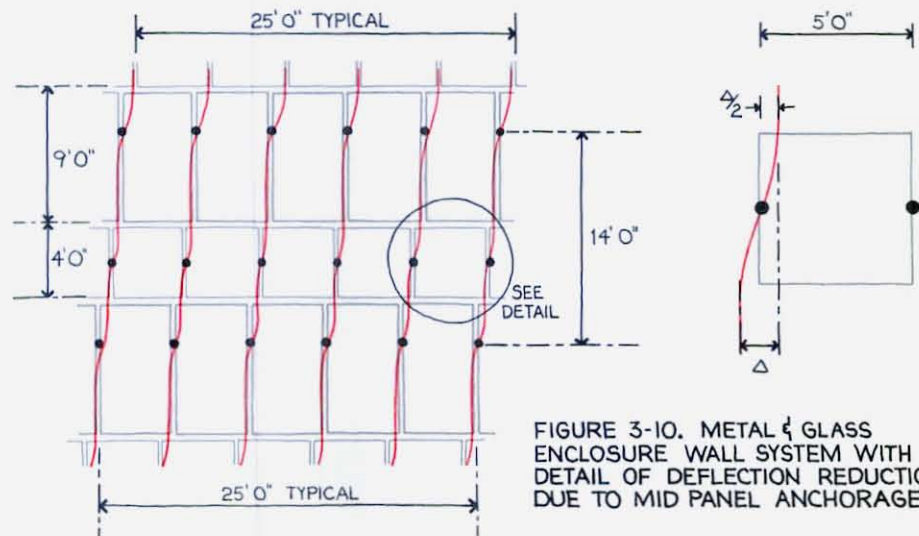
METAL & GLASS ENCLOSURE WALL SYSTEM WITH DETAIL OF DEFLECTION REDUCTION DUE TO MID PANEL ANCHORAGE.
